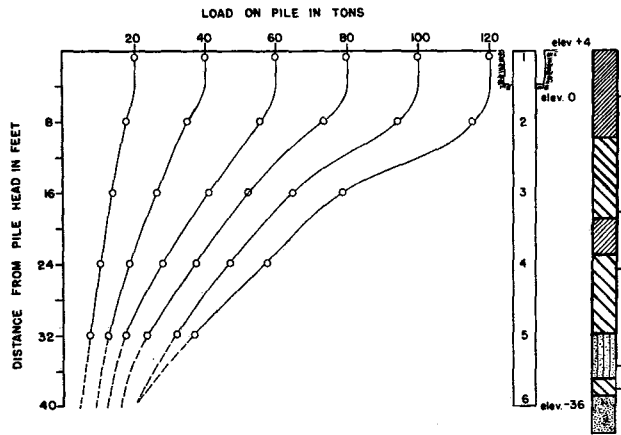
Pile load distribution for Chocolate Bayou Bridge, 40-foot pile.
